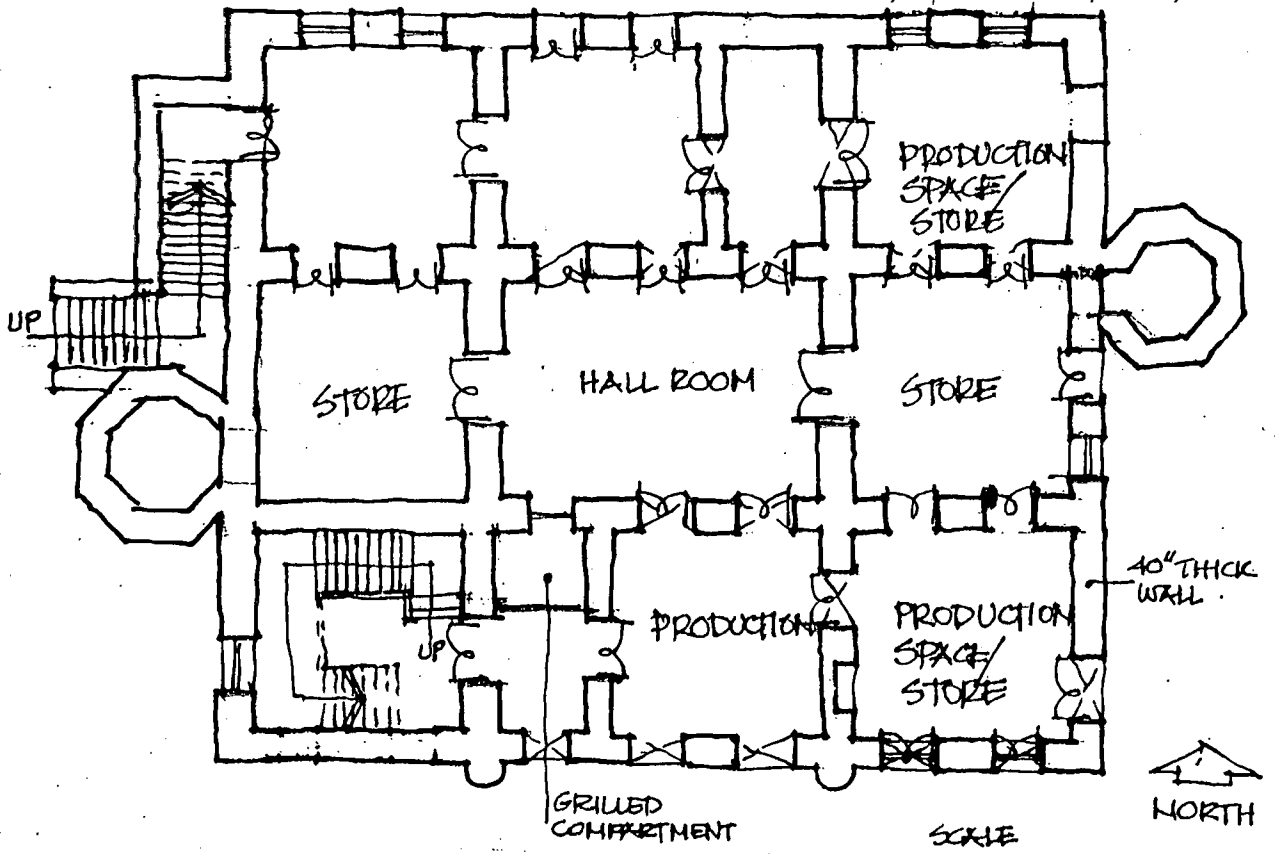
Ground floor plan, Bara kuti, Rajshahi
